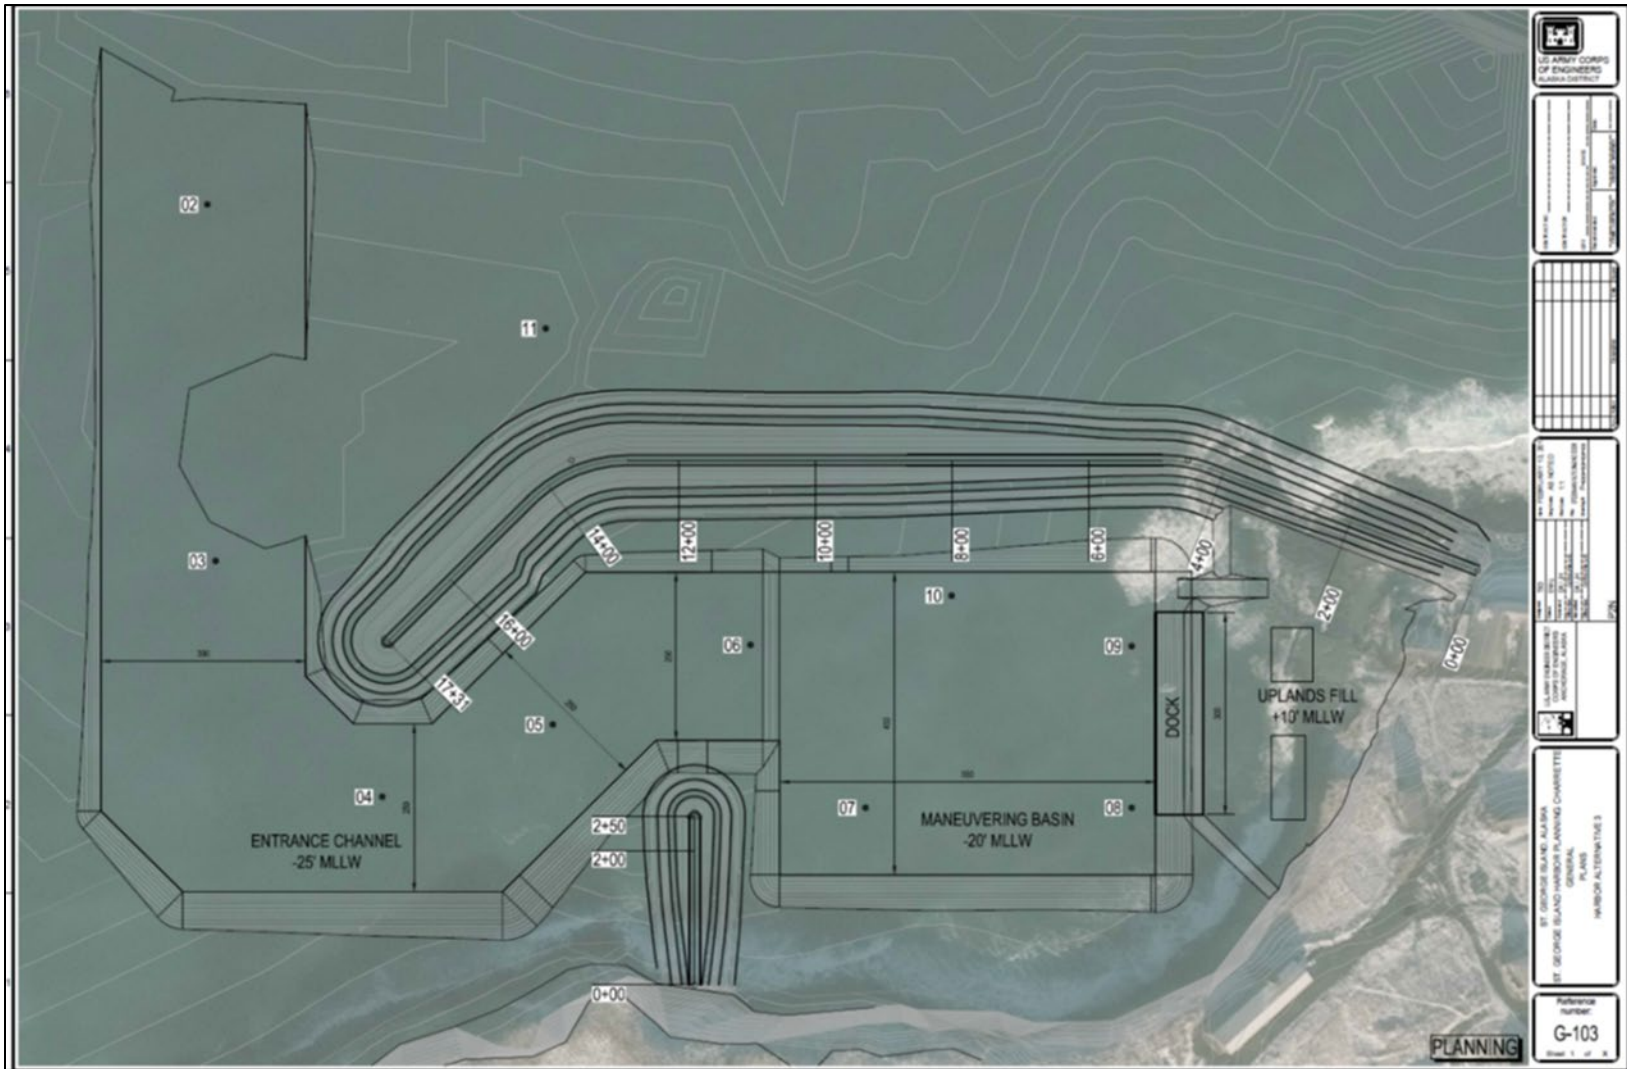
St. George Navigation Improvements Project Features Concept Drawing
